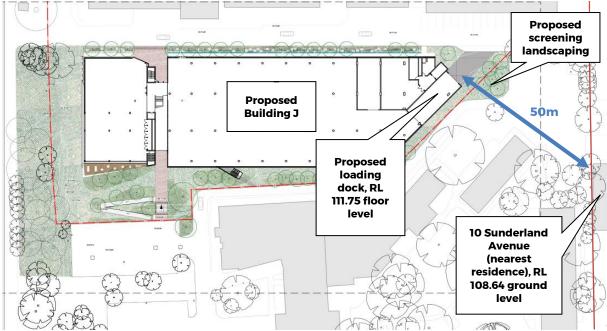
Proposed landscape site plan and proximity of loading dock to nearest residential dwelling Source: ASPECT
